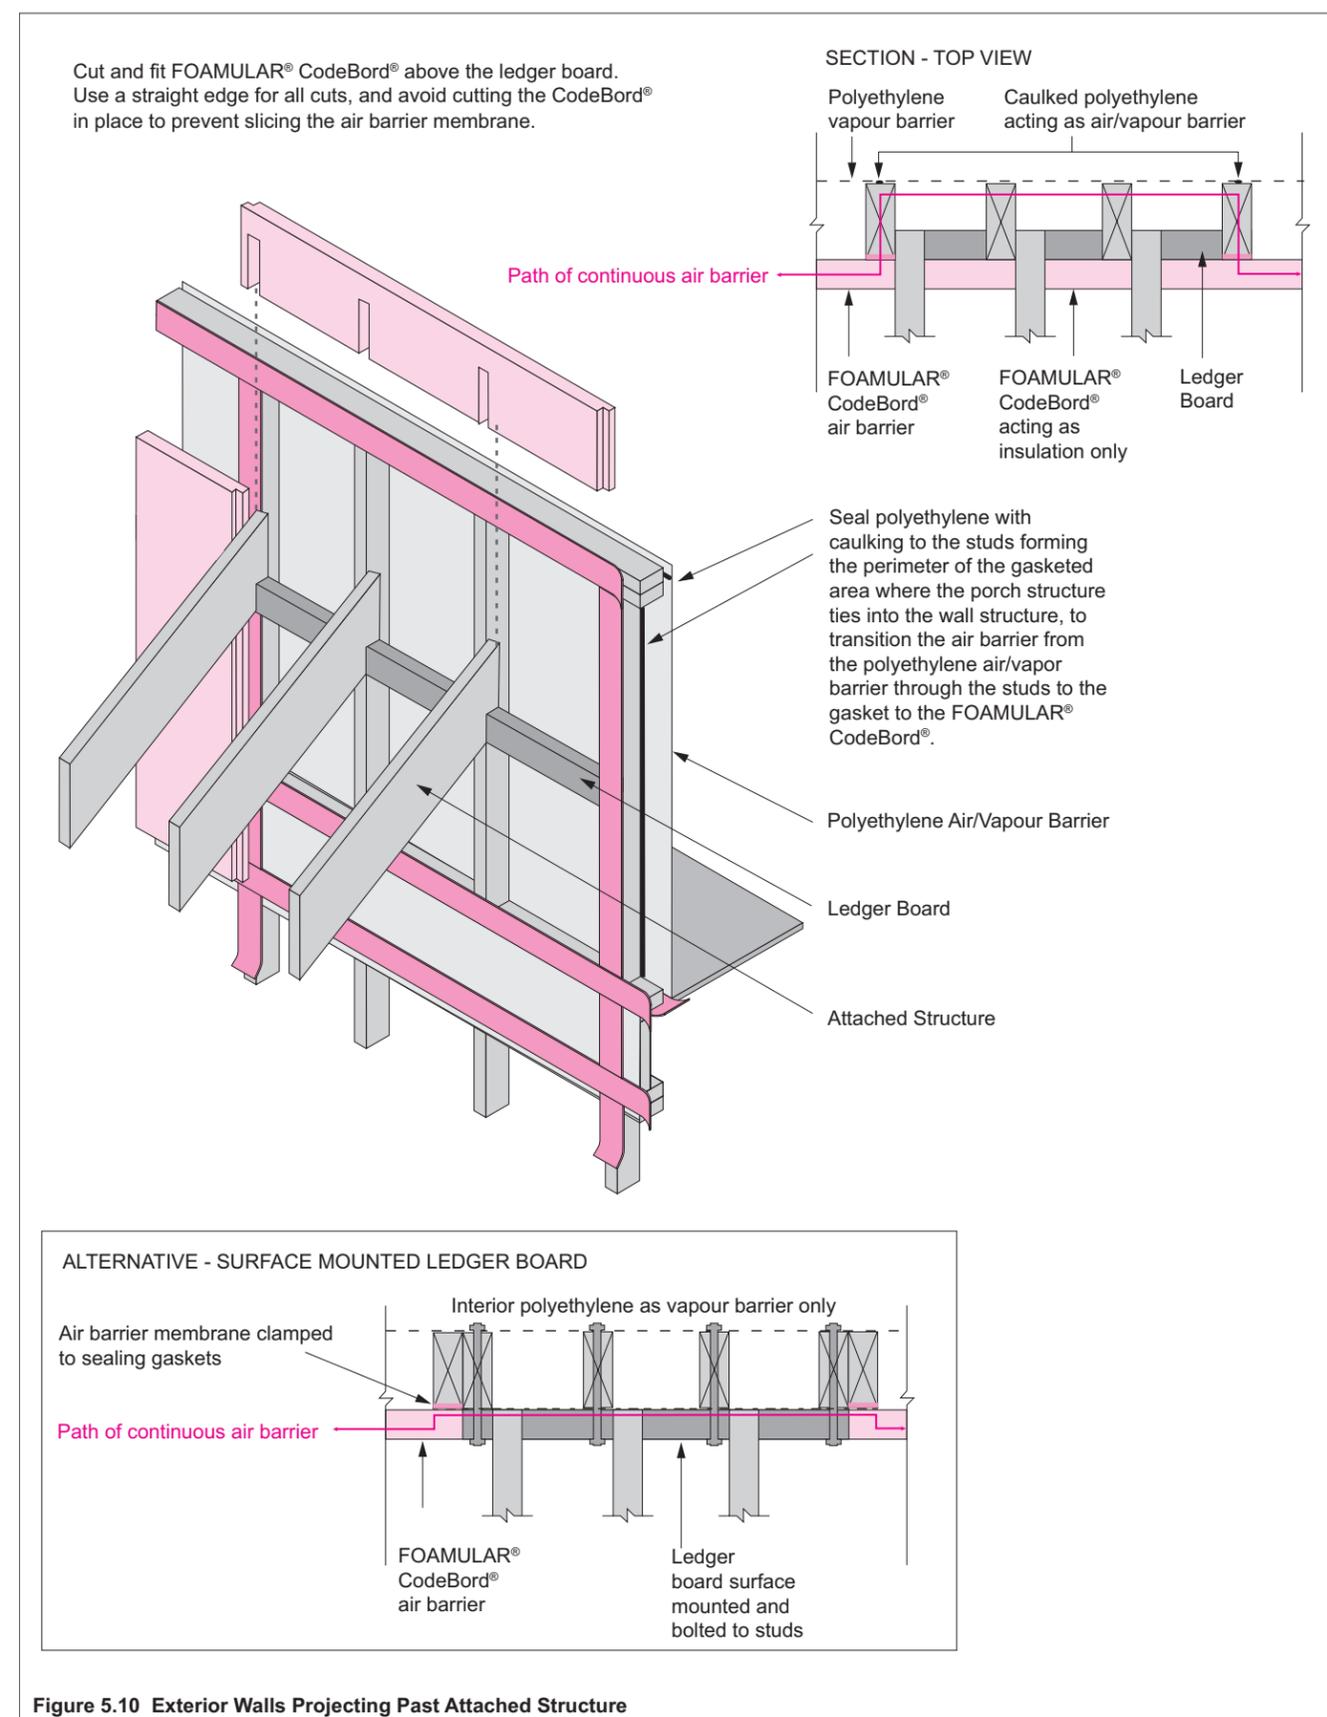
Exterior Walls Projecting Past Attached Structure
